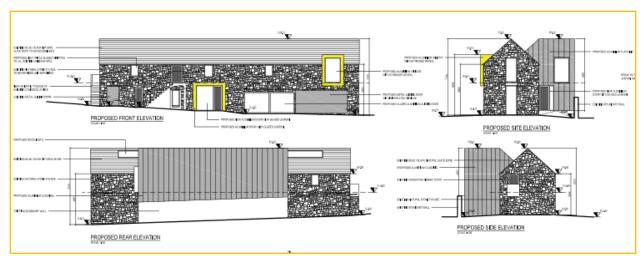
Elevational plans of the proposed Creative Hub. This proposal provides for the refurbishment of an existing stone barn with a historical use as a factory. The new Hub will provide a shared workspace at first floor level and shared retail/exhibition space at ground floor level for local and indigenous designer makers.
